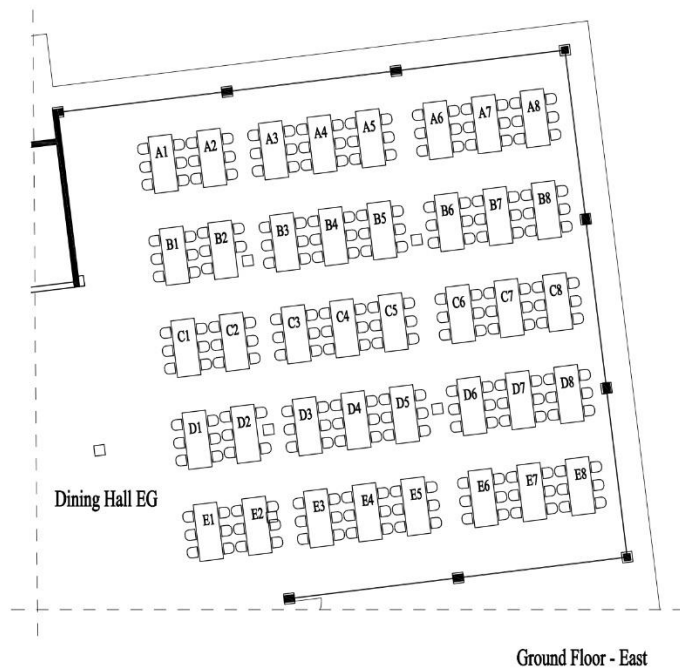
Ground Floor Plan and Temperature Data Notation of East Dining Hall
